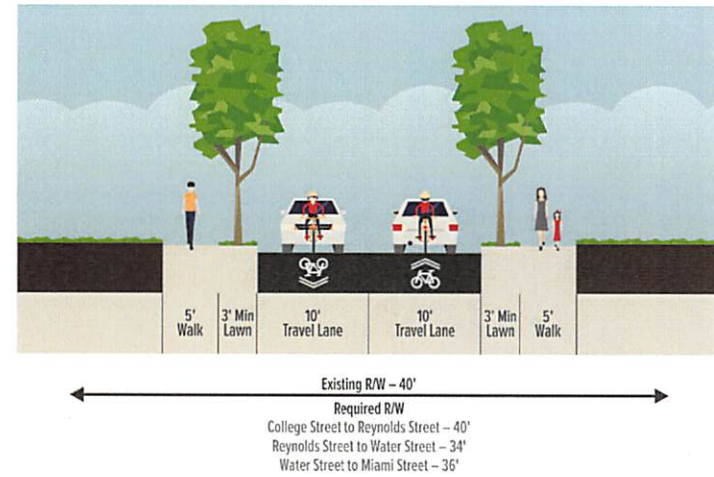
COLLEGE STREET TO MIAMI STREET
